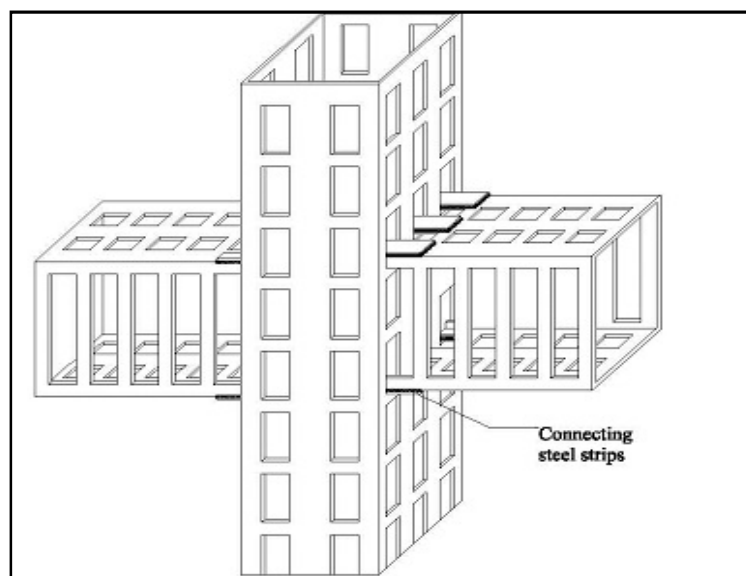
Connection with steel strips and welding the beam transverse reinforcement to the column
